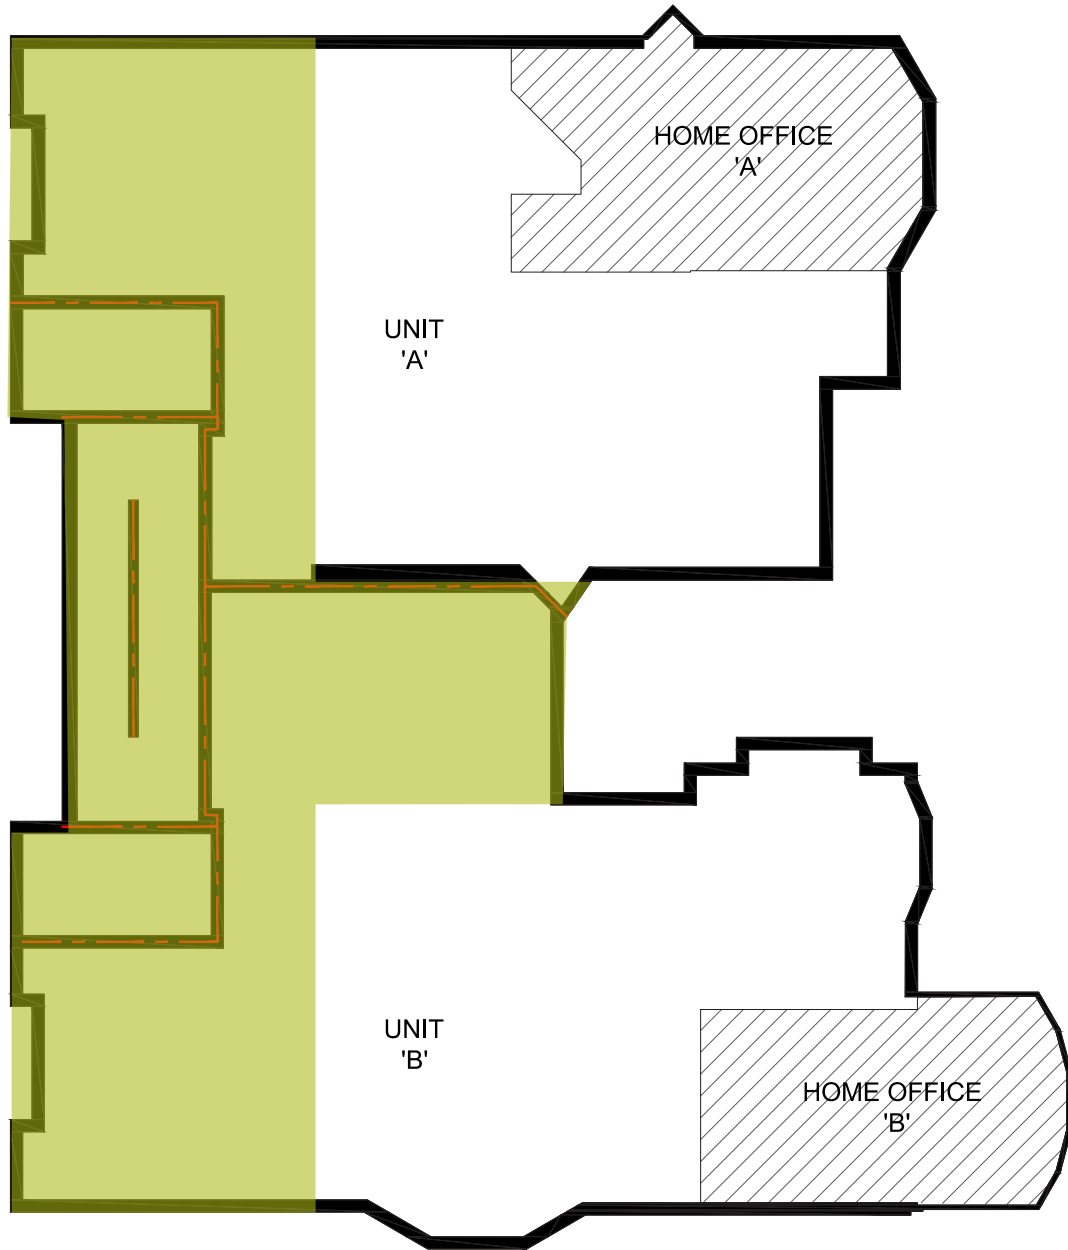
Ground floor plan of proposed residential development at 551-555 Waterloo Street. The green highlights where the new addition will be incorporated into the existing buildings utilizing existing openings in the original building on the west elevation for access. The previous line of the pedway above that currently connects the two buildings is followed by the new "link" on all levels. Blue indicates possible home office spaces within the units. The complete set of plans are included as part of Appendix C of this HIA. Drawing by a+LiNK architecture inc., 2020.
